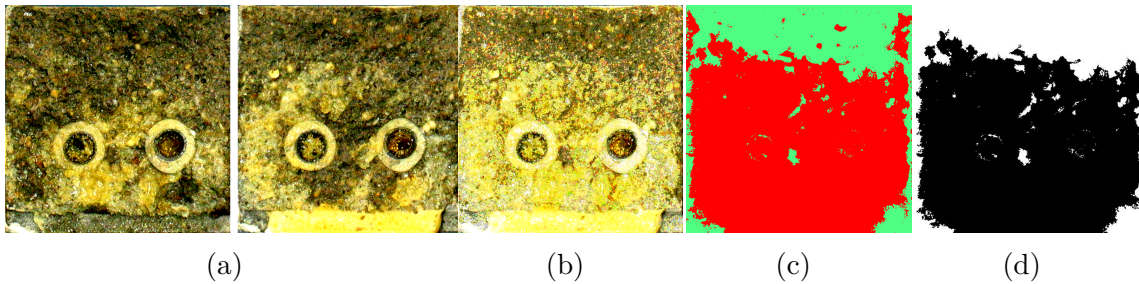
Segmentation process: (a) crack faces with enhanced contrast, the right face was flipped horizontally; (b) crack face after overlay; (c) picture segmented with Trainable Weka Segmentation; (d) outliers removal and binarization.
